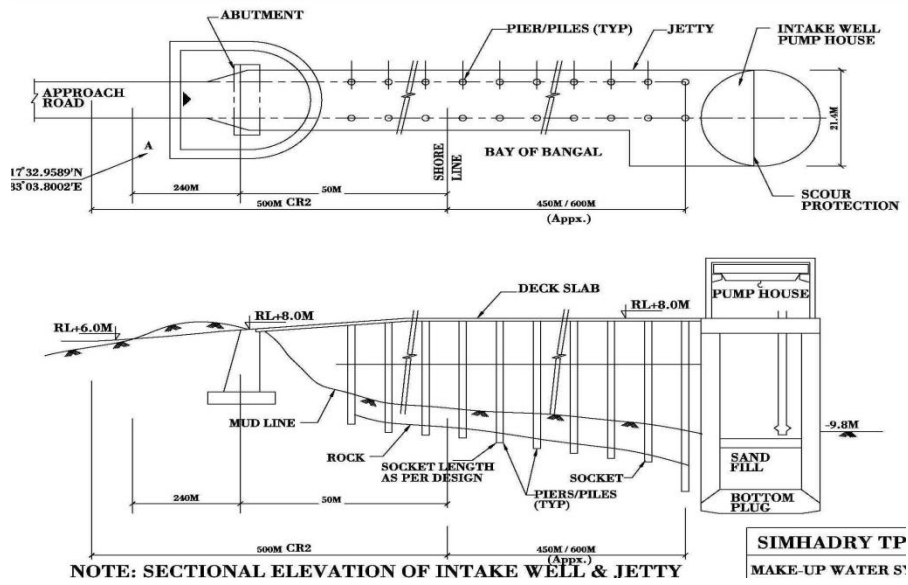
Sectional elevation of the approach Jetty and Intake well.
